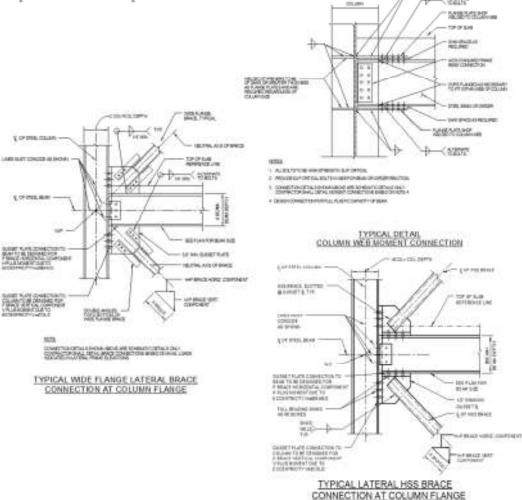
TYPICAL COLUMN WEB MOMENT CONNECTION (TOP RIGHT). TYPICAL LATERAL HSS BRACE CONNECTION (BOTTOM RIGHT). TYPICAL WIDE FLANGE LATERAL BRACE CONNECTION (LEFT). ALL DRAWINGS ARE NOT TO SCALE. DETAILS COURTESY OF TURNER CONSTRUCTION.
